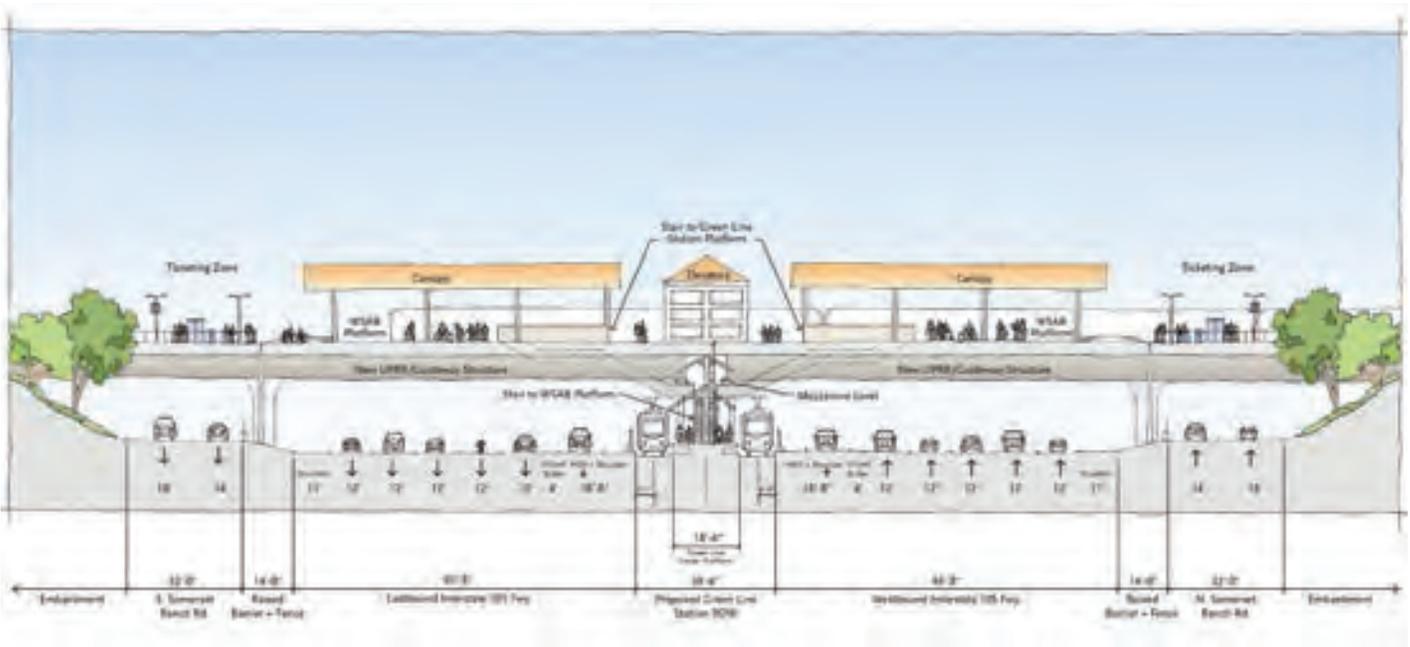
Conceptual cross-section drawing (looking west) for a new Metro Green Line Station below a new WSAB Station at Florine Ave. and Century Blvd. in the City of Paramount
